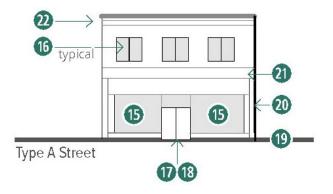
Commercial Storefront Building Elevation: Facade Design Requirements
